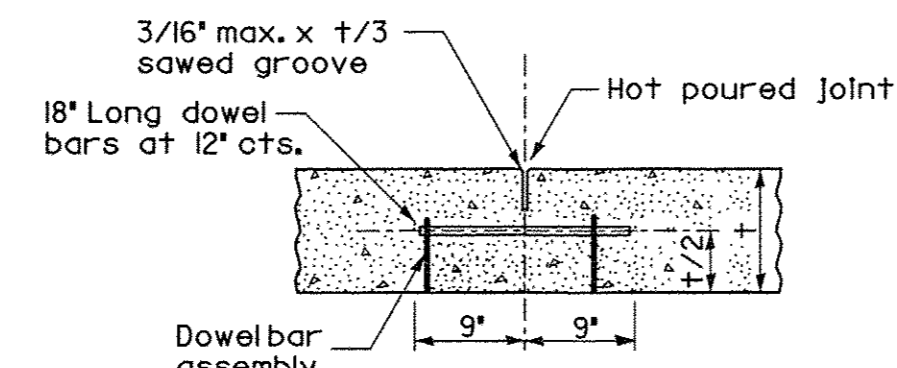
DETAIL OF CONSTRUCTION JOINT, SPECIAL
